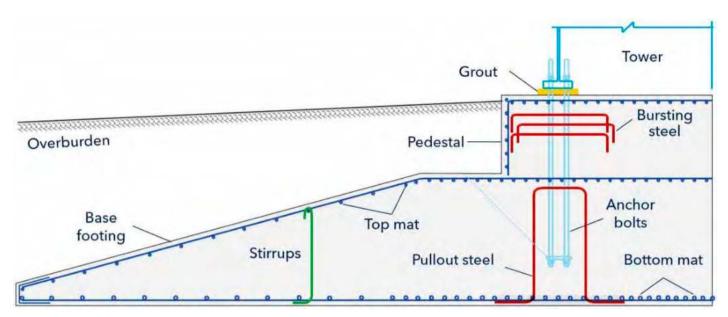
Cross Section of a Typical Wind Turbine Foundation
